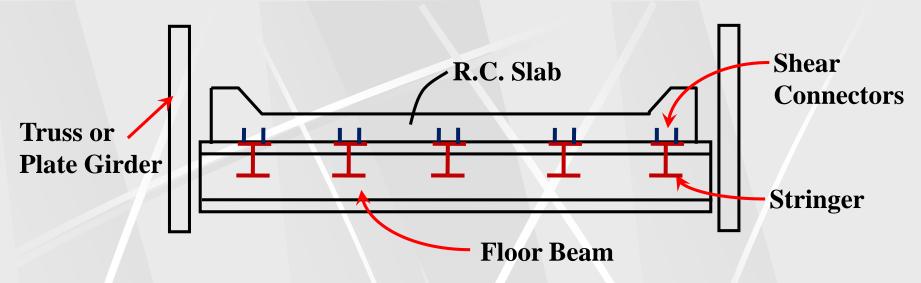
Typical Cross-Section of a Steel Bridge.
